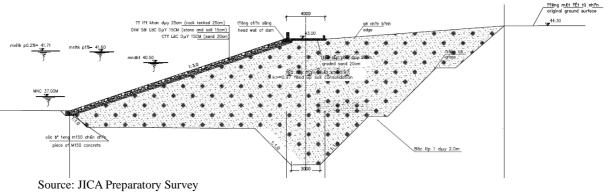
Cross Section of Stone Masonry Wall with Slope
